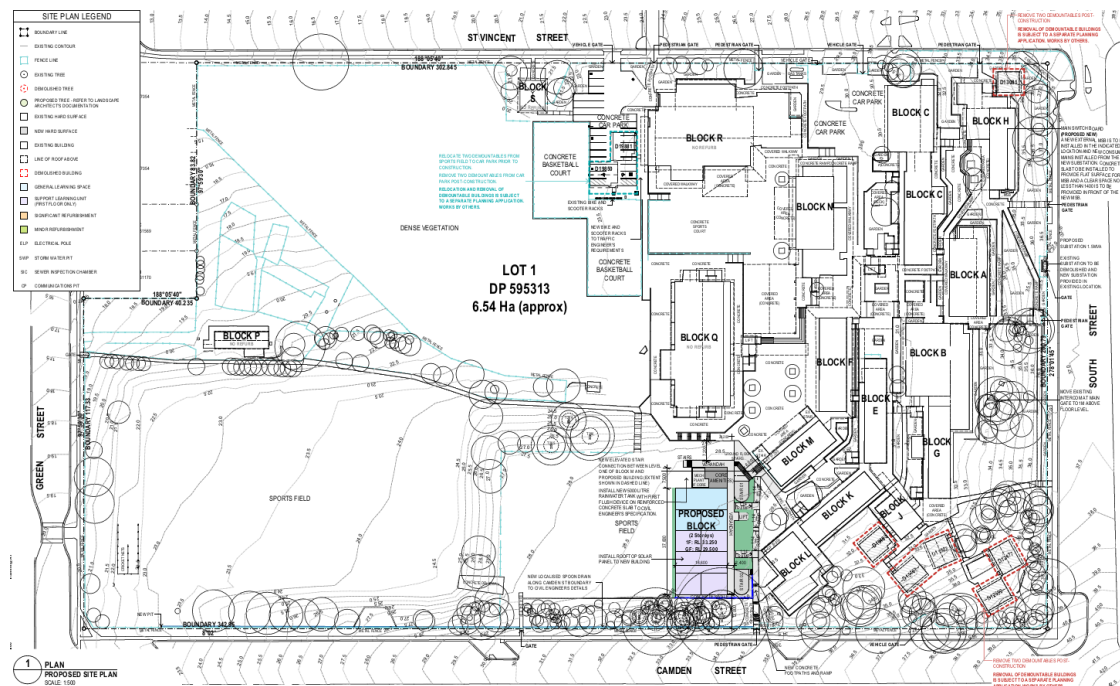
Extract of the proposed site plan (Source: Fulton Trotter, 2025)
